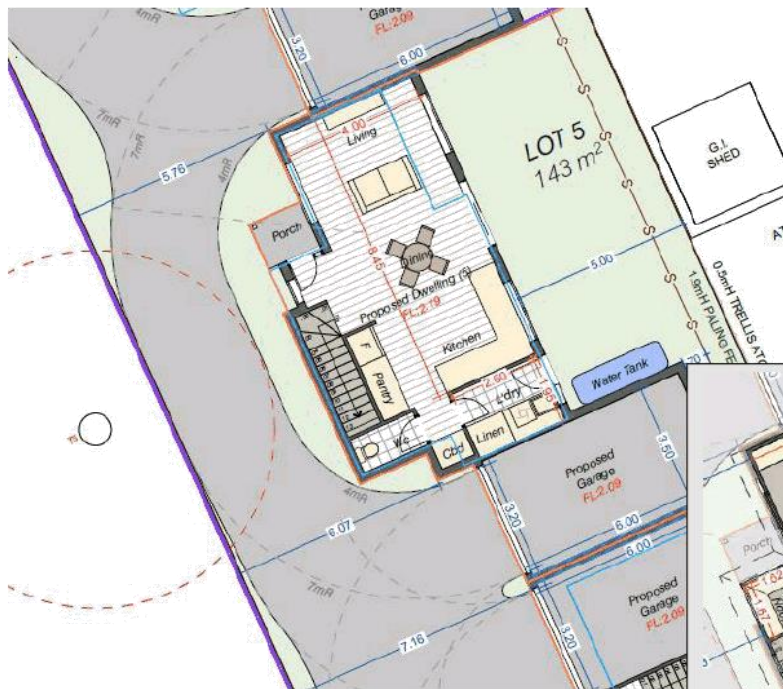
Example ground floor layout of the slightly larger homes on Lot 5/6
